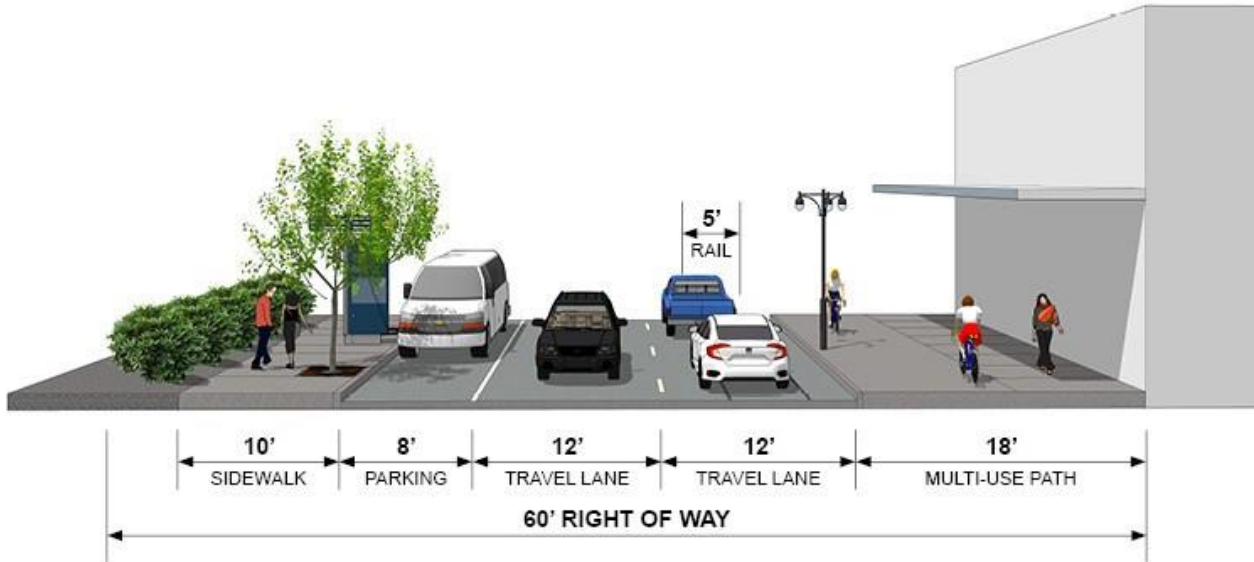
Alternative 1 - Proposed Section C and D (Cedar Avenue to Alder Avenue)
